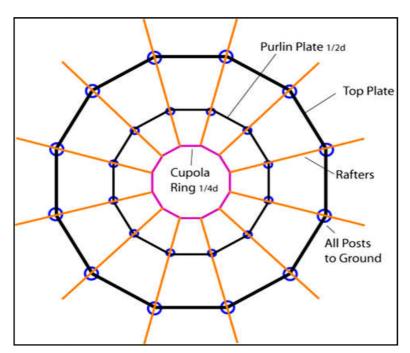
Plan of Typical Traditional Conical Roof. Source: https://images.app.goo.gl/rHSmzcgVR16Jggwz9, 2017.
